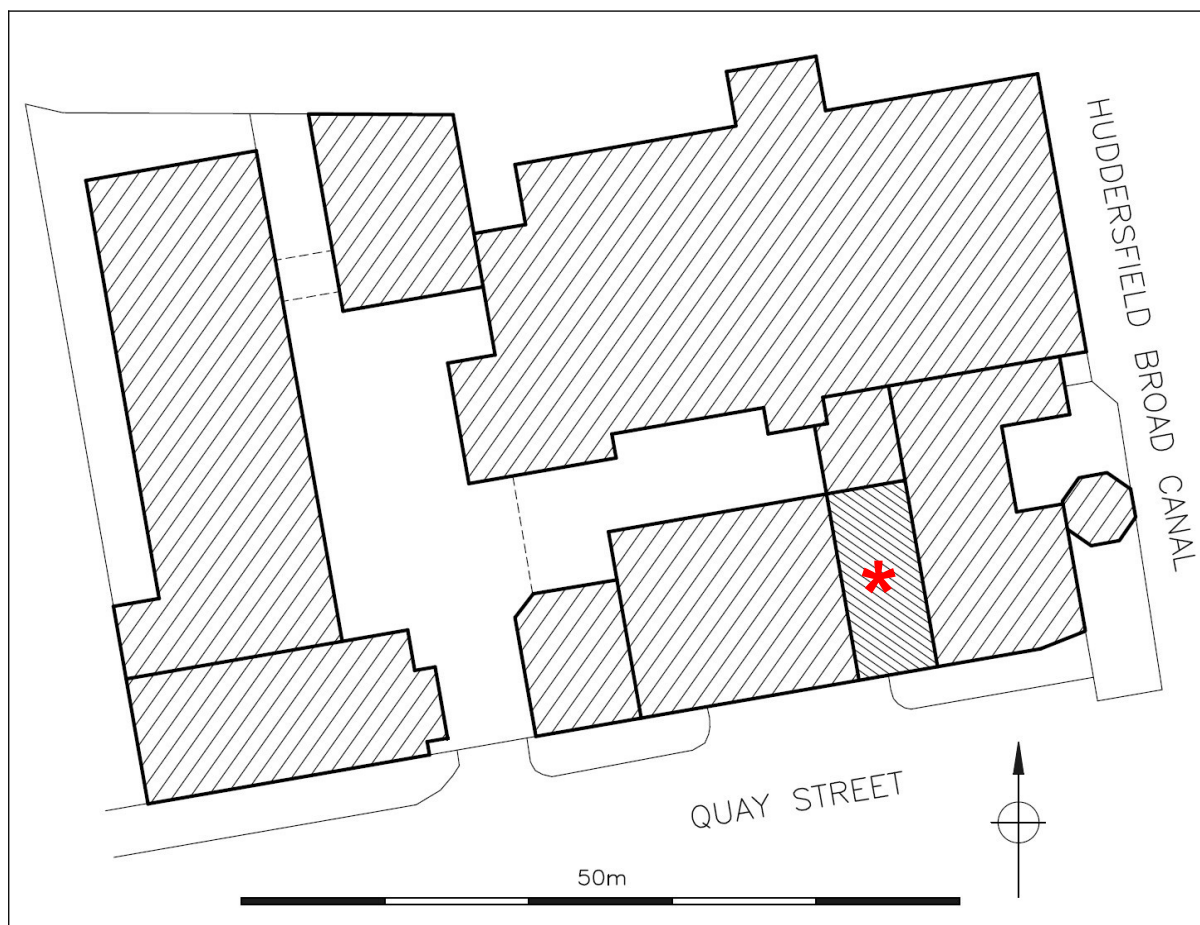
Plan of Turnbridge Mills, with former engine house marked (1:500)
